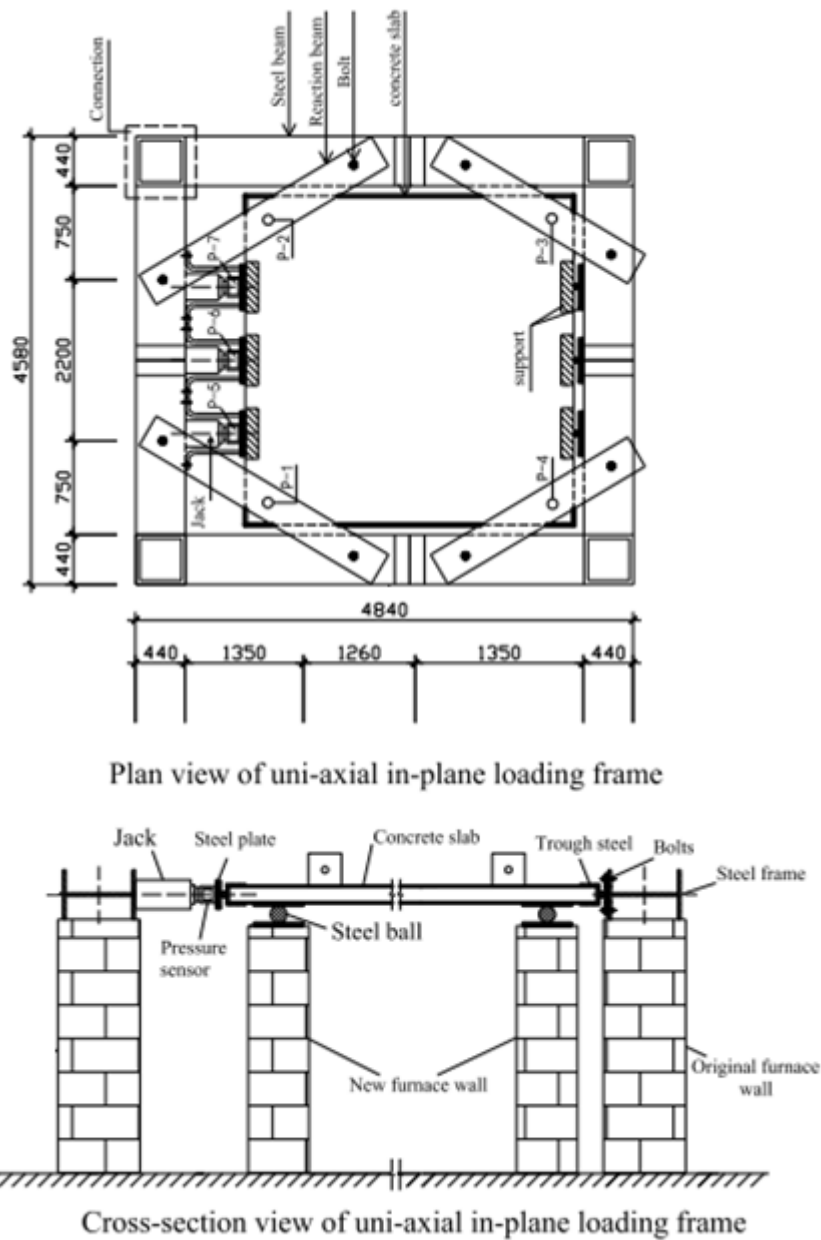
Plan view and cross-section view of in-plane loading frame reproduced from Wang et al. (2016)
